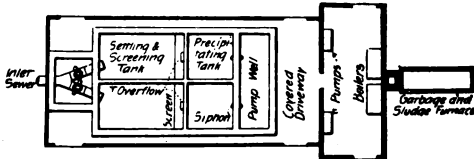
Sketch Plan of Sewage Purification Works at Coney Island, N. Y.
